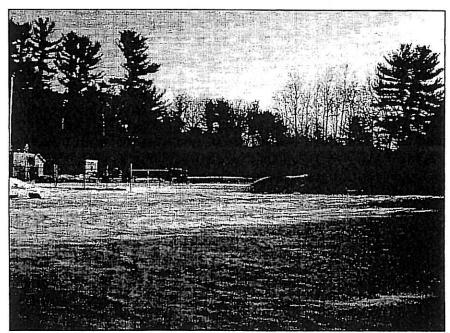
View of existing Laconia Meter Station (left) and proposed additional temporary workspace, view facing northeast (note push-pile in center of photograph).
